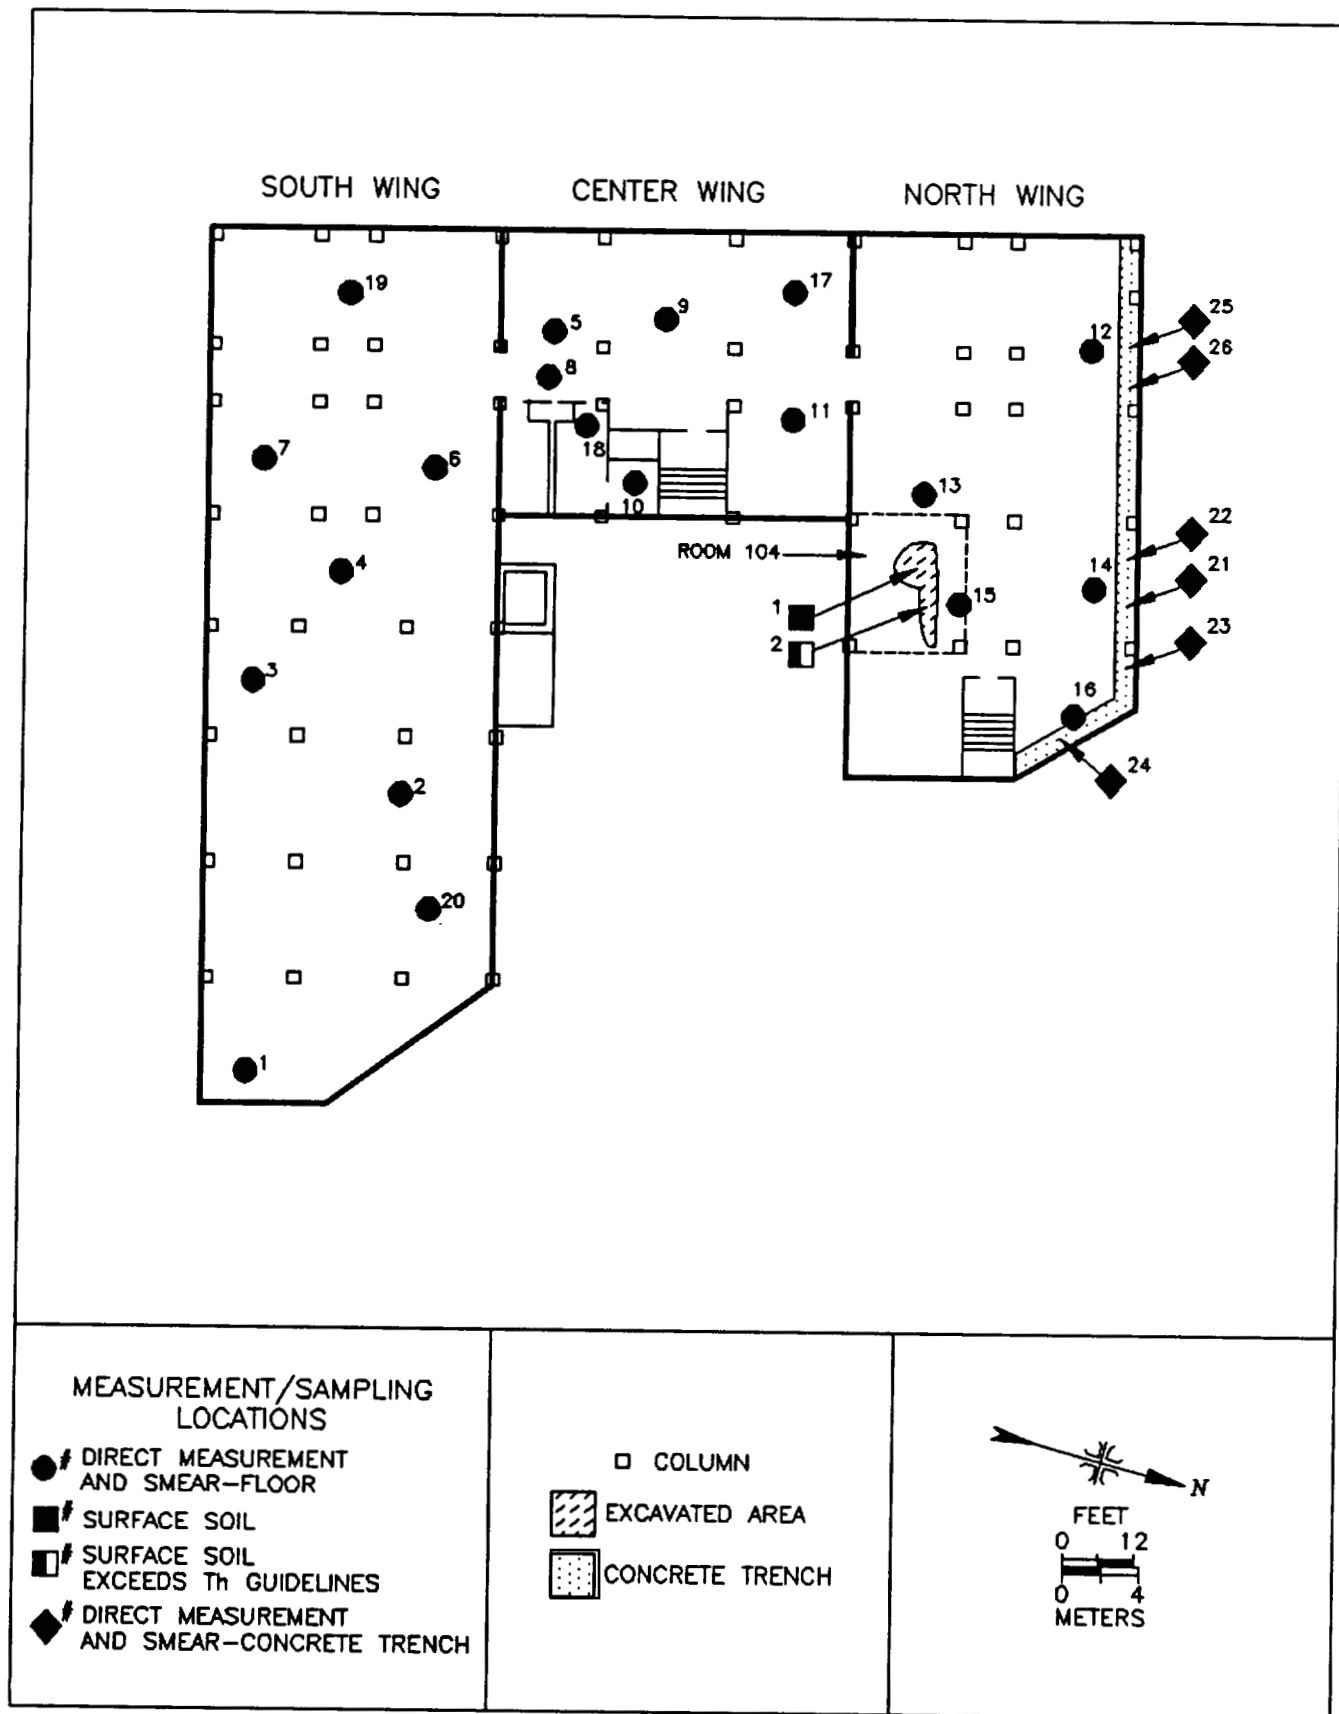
Building 7, First Floor – Measurement and Sampling Locations
